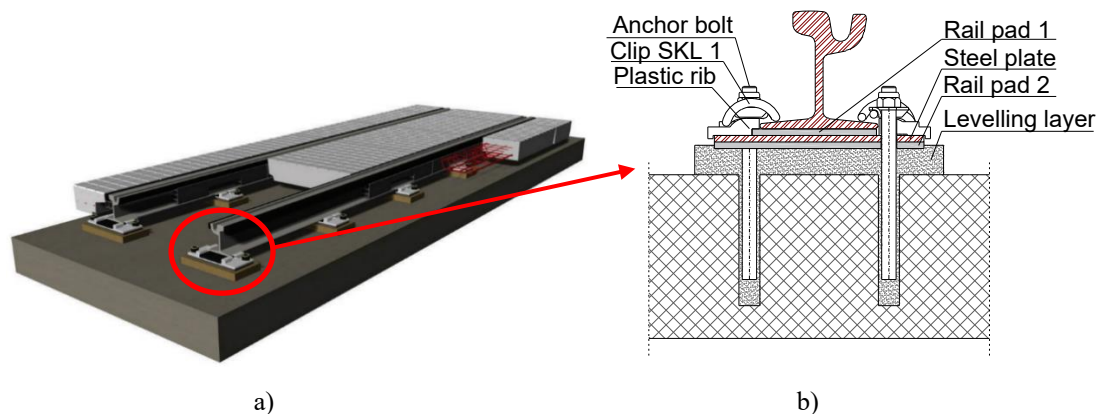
a) track with discretely fastened rail, b) cross section of fastening system [1]
